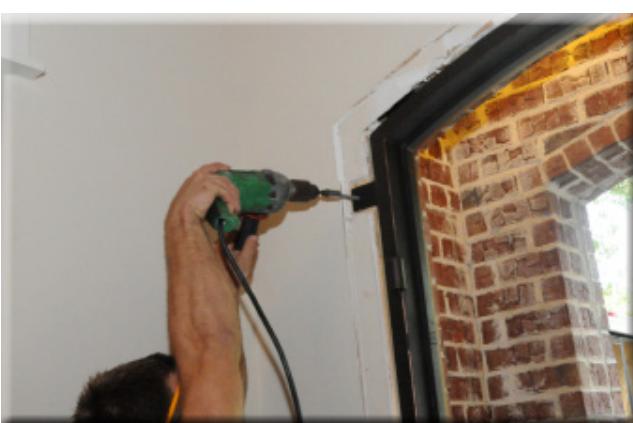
Screw in the top side brackets. Only four screws will be used to hold up the jamb until door is fully adjusted.
